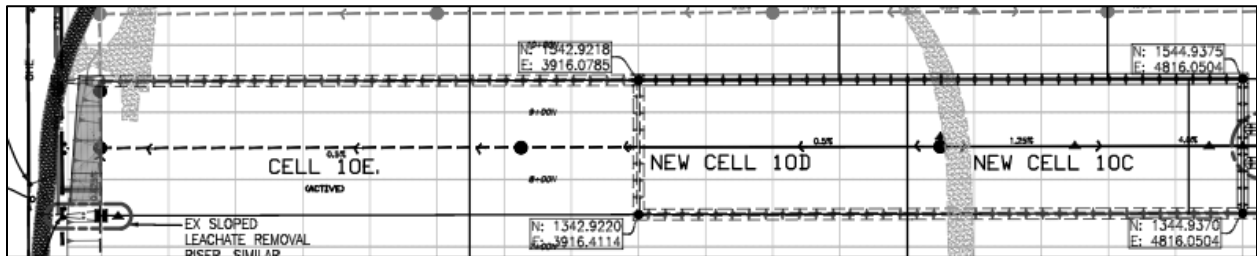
Engineering site plan top view of North Slope (City of Enid)
